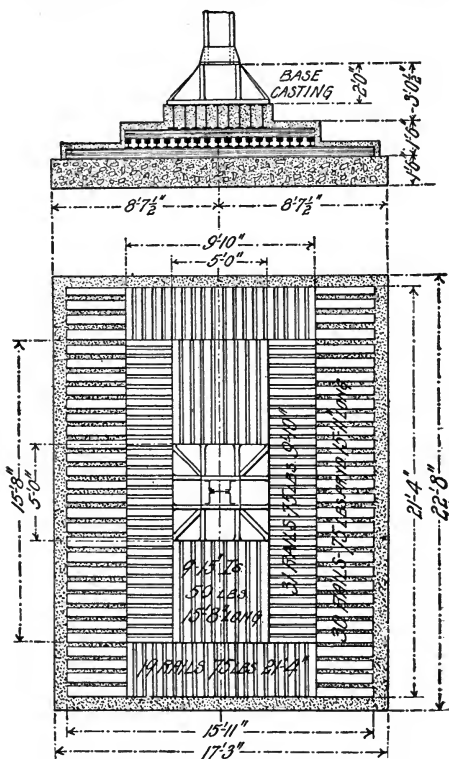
Detail of Beam and Rail Footing in "The Fair" Building.
